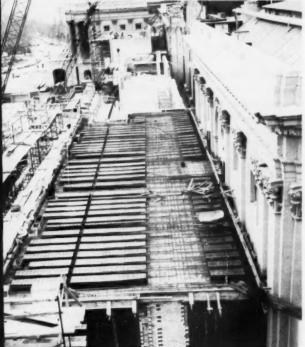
The wing immediately adjacent to the dome, showing continuous footings under cantilevered floors.
